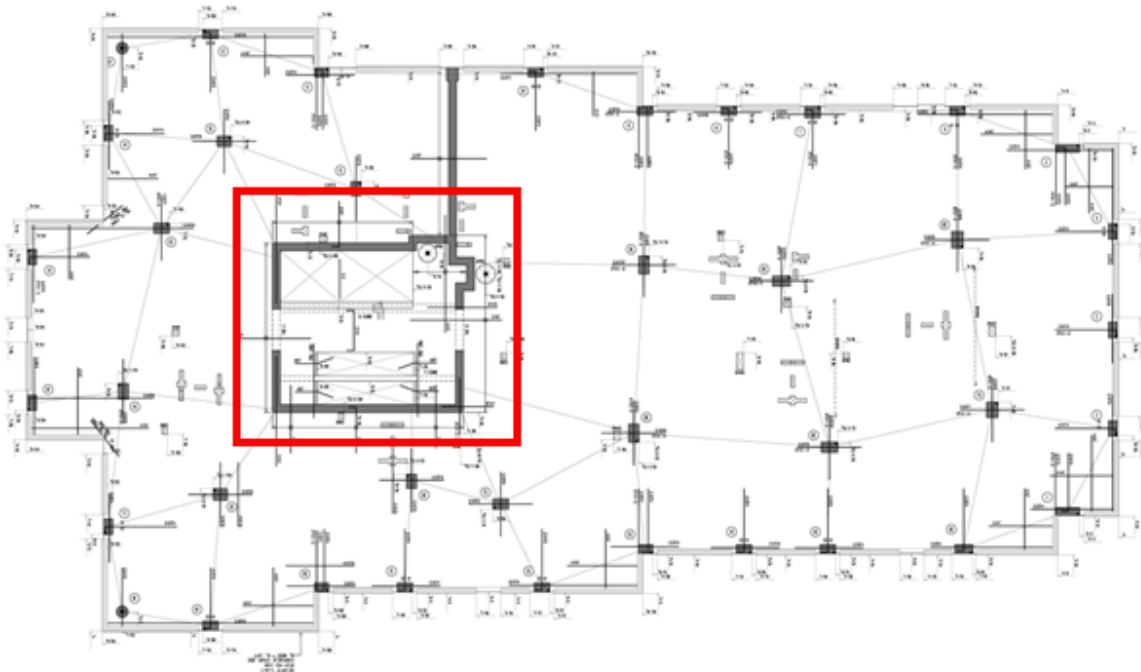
Typical existing structural floor plan with the elevator and stairwell core boxed in red
